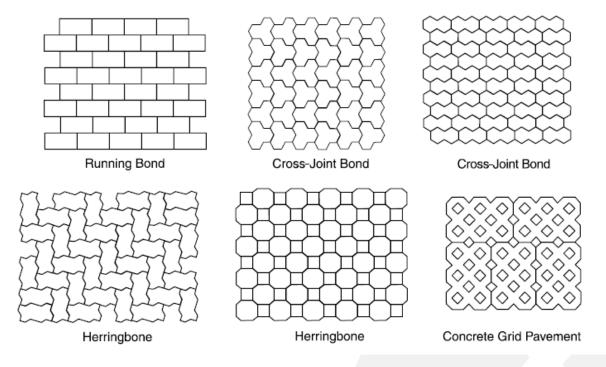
Various patterns for installation of permeable concrete pavers (Interlocking Concrete Pavement Institute, 2004)
